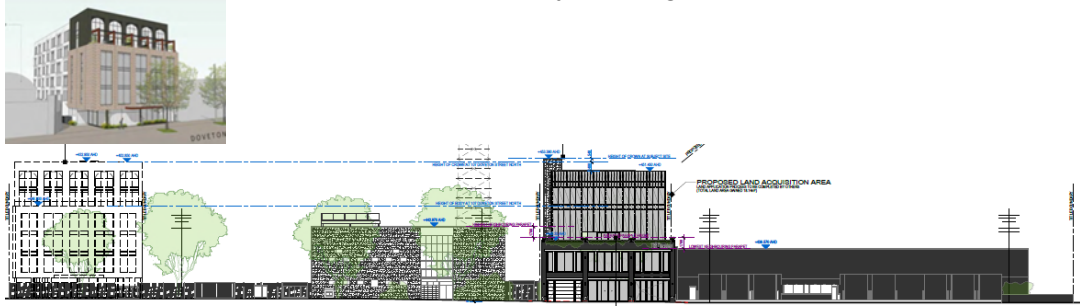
Streetscape view . Source Application plans by Project Now Architects
